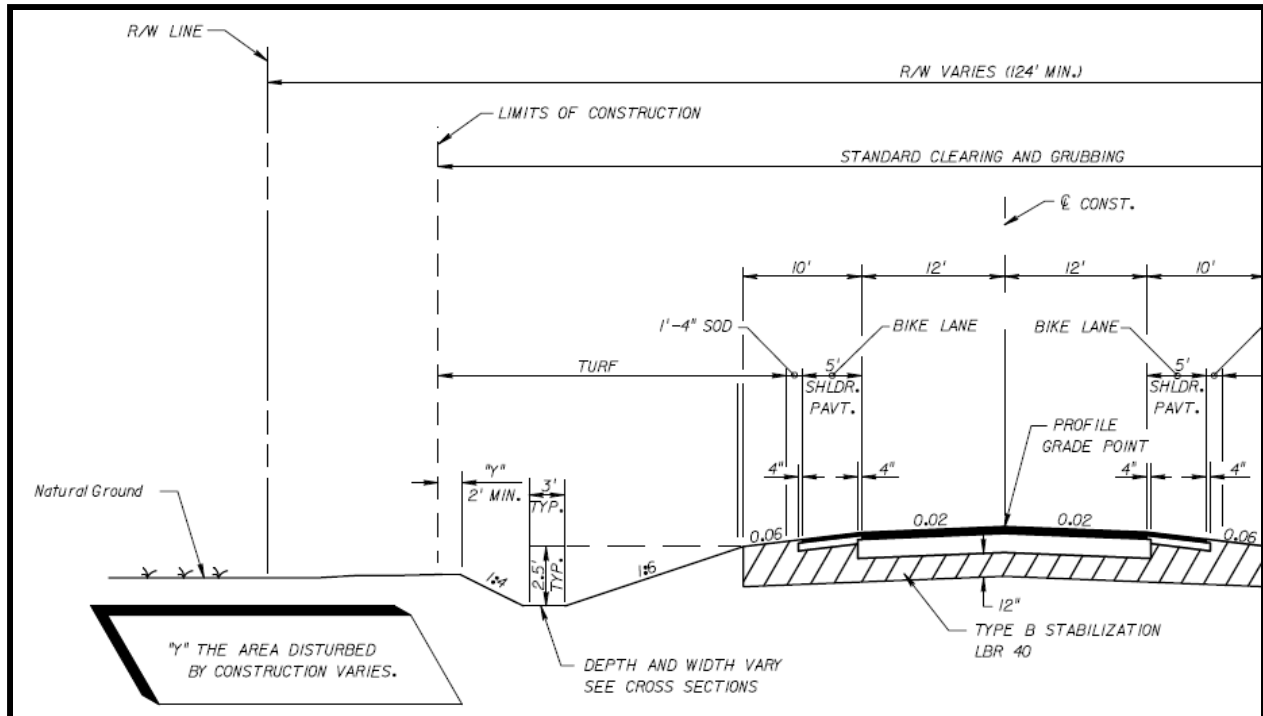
Typical Ditch for Two Lane Rural Roadway
